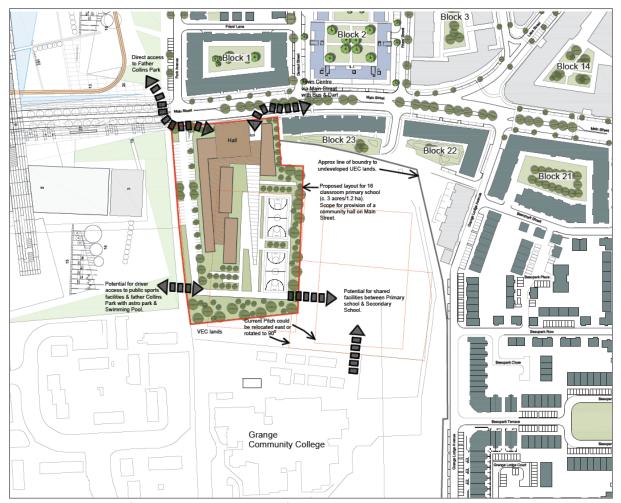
CCK Architects' Indicative Sketch Proposal for City Development Plan School Designation Site
